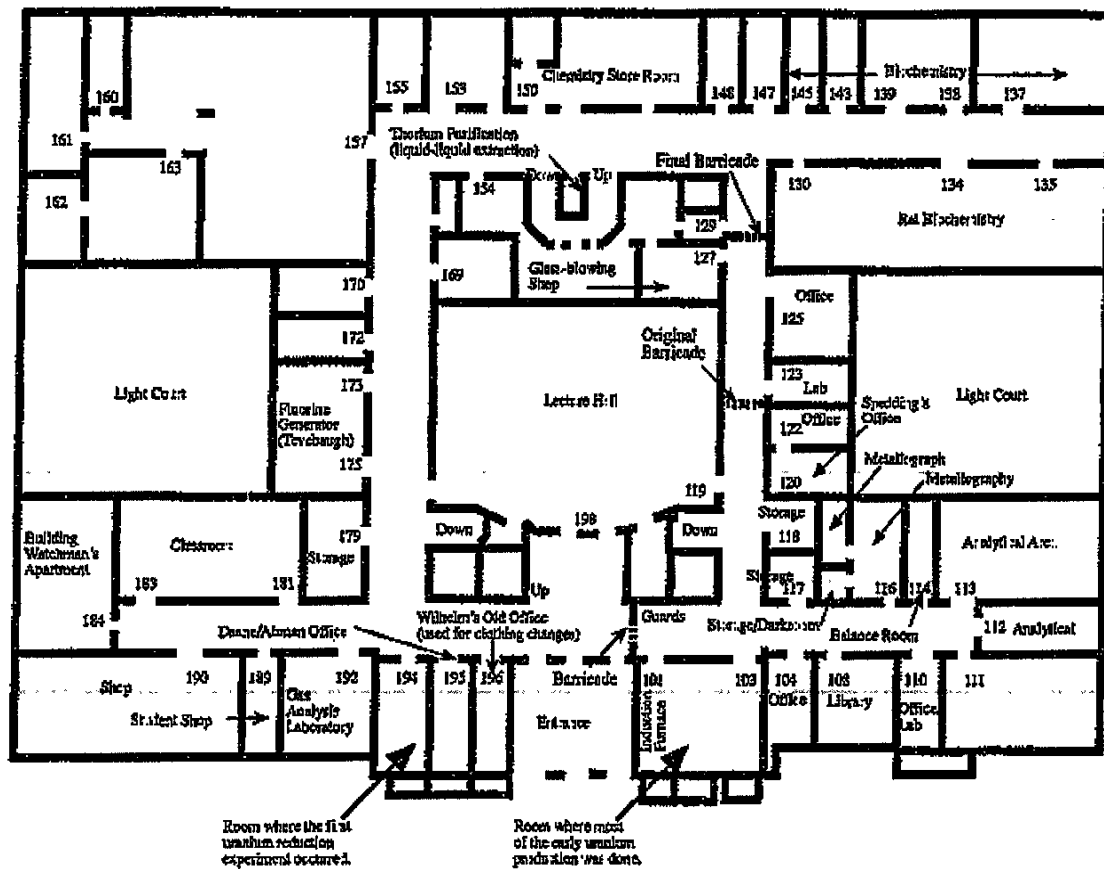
First floor plan of the Chemistry Building where the research and development work were carried out. Included are: the barricade on the east hallway and Room 101/103 where the early reduction experiments for the University of Chicago were completed. (The labeling for these rooms was provided by Norman Carlson, David Peterson, and Harry Svec, former participants on the project.)
